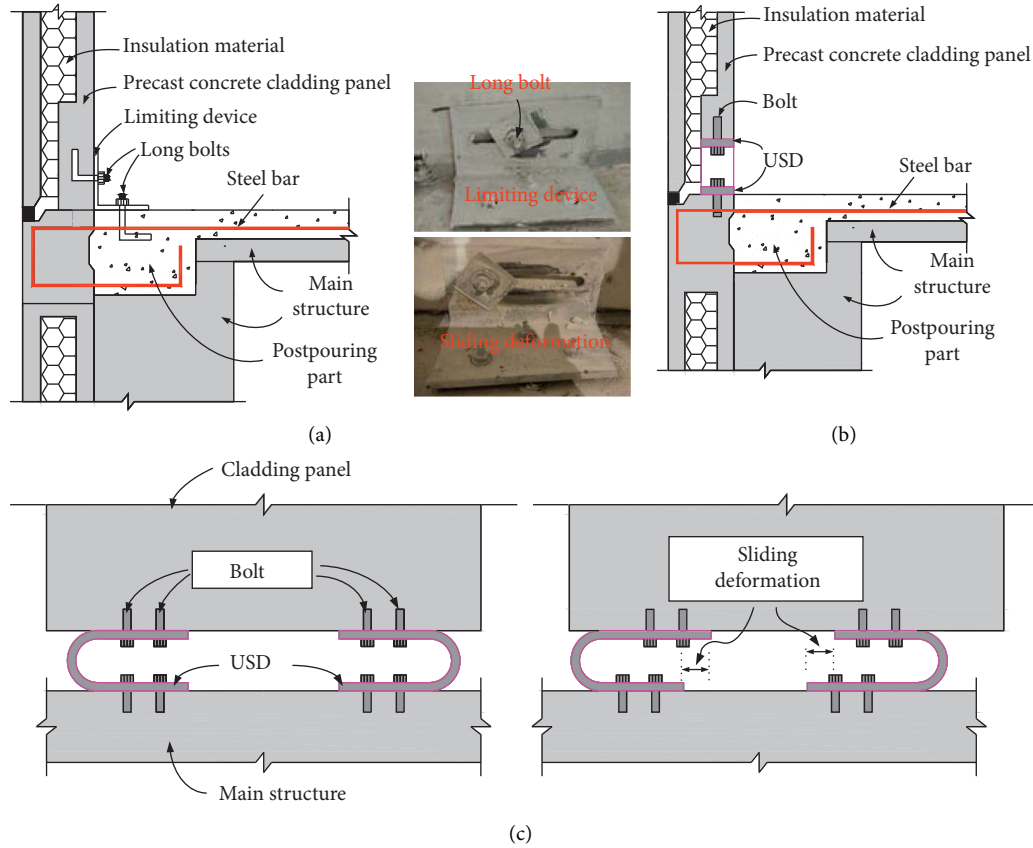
Connection details and deformation mode of the proposed damping cladding panel. (a) Typical cladding connection 2 in China. (b) Connection details. (c) Deformation mode of the proposed damping cladding panel.
